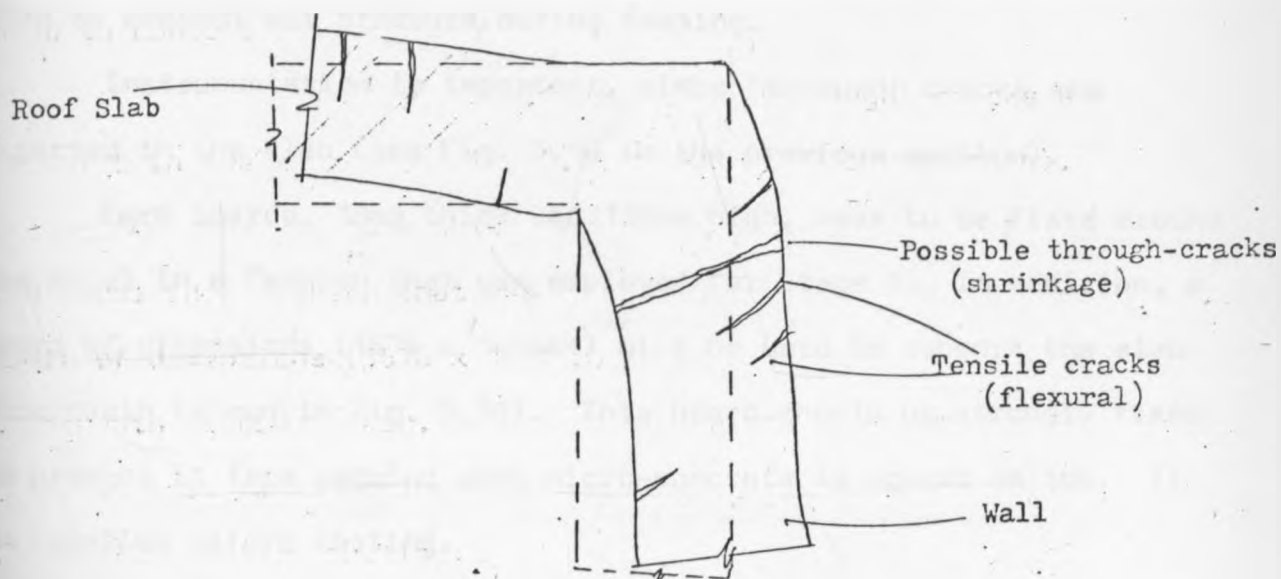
Formation of Cracks at Wall/Roof intersection
